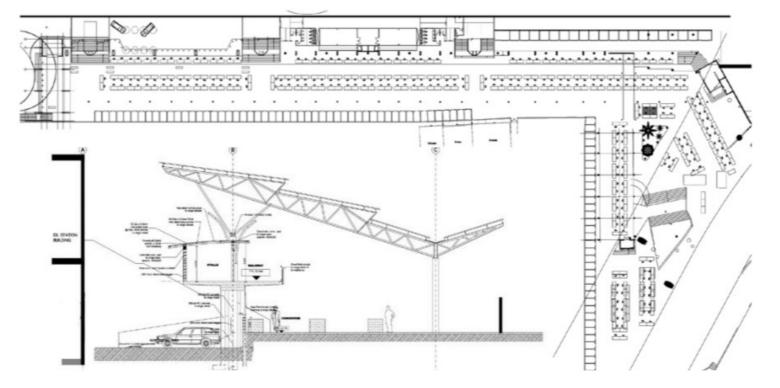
Plan and section of the Brook central market (The South African Insitutue of Architects n.d.).
